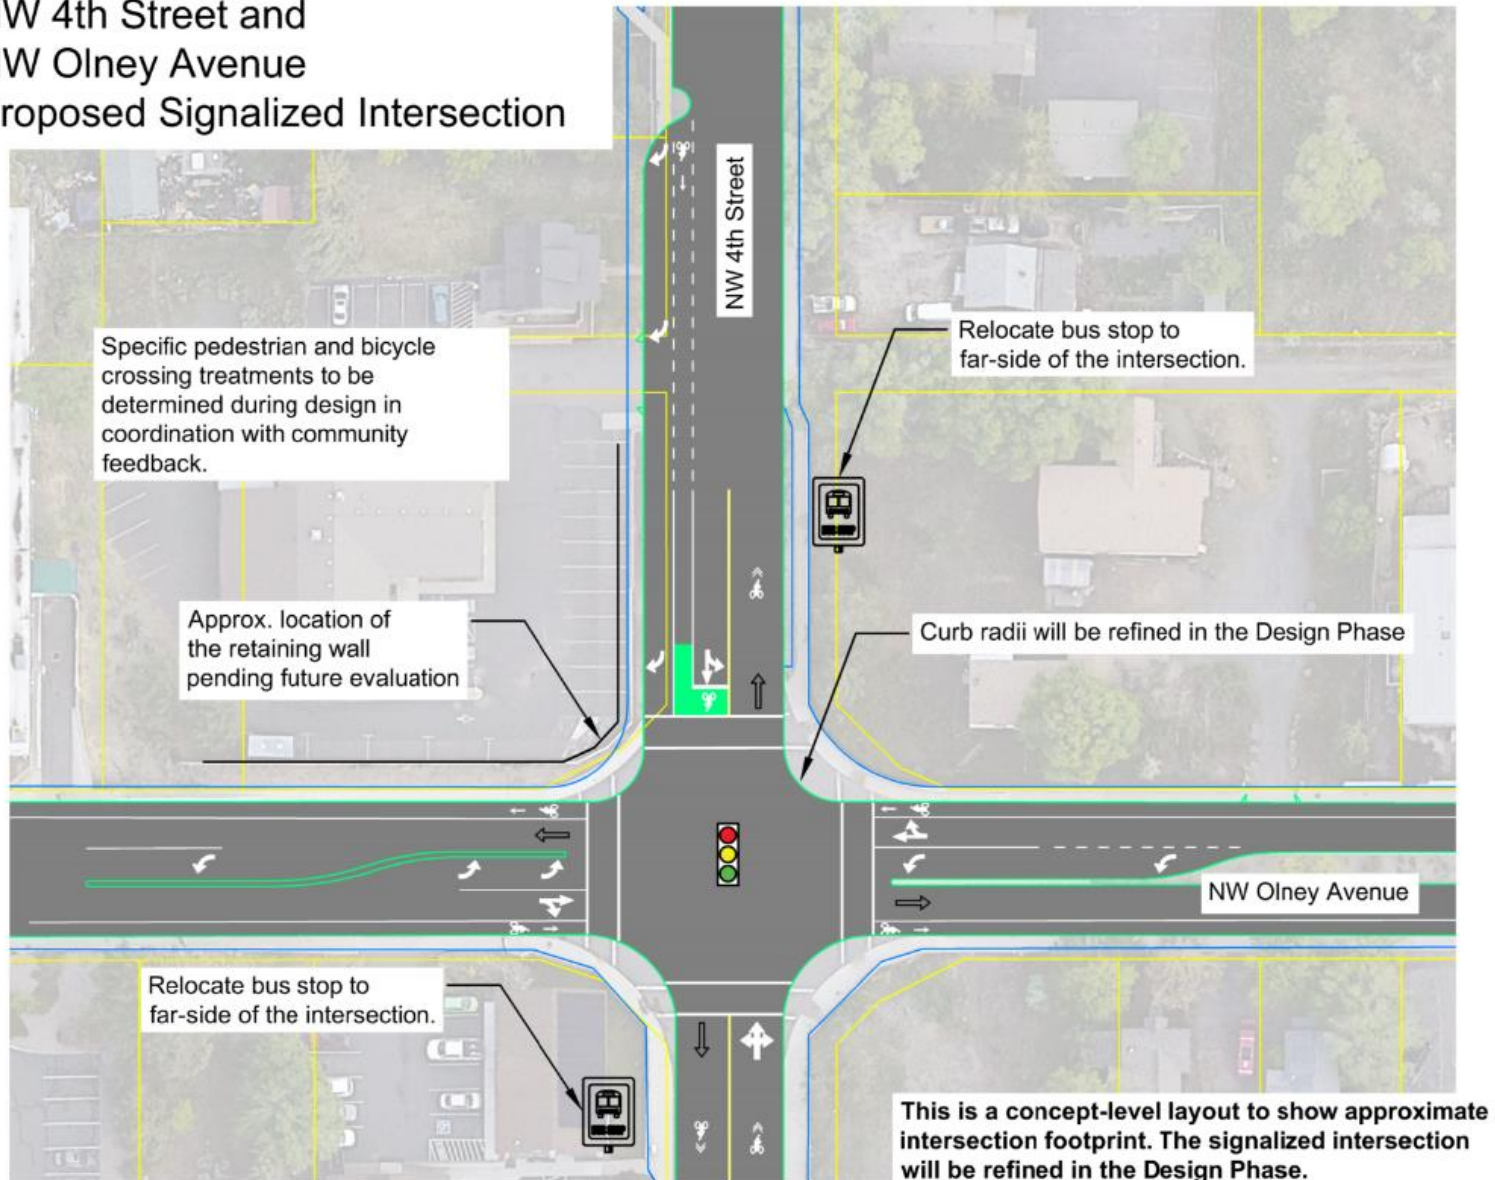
Proposed Signalized Intersection Layout at NE 4th Street and NE Olney Avenue
